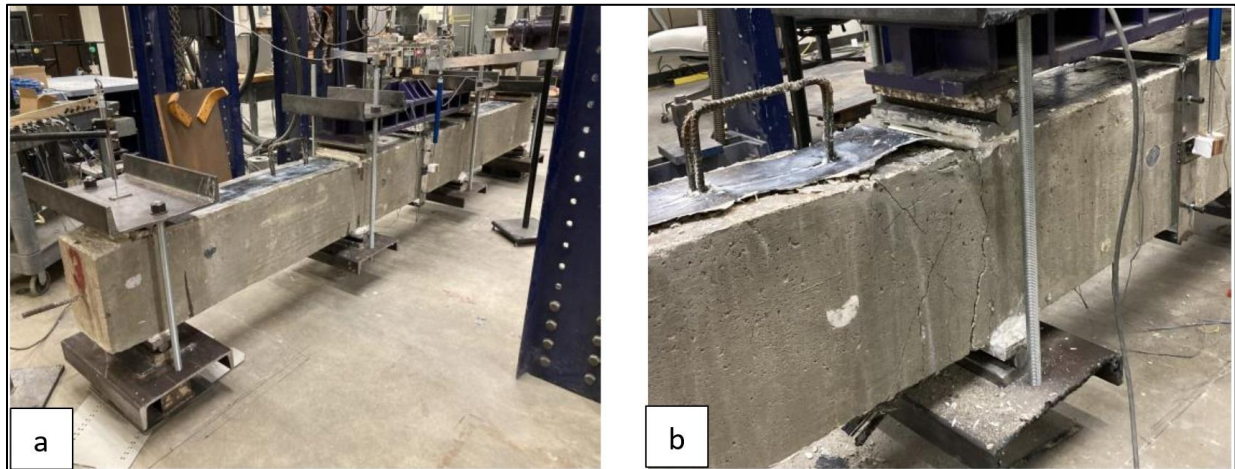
Specimen No.3. (a) before testing. (b) at failure
